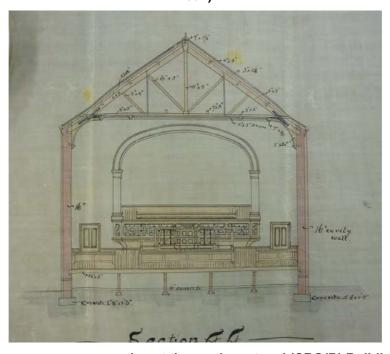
Proposed transverse cross-section at the north-east end (CRO(B) Building Control 3237 1894)
